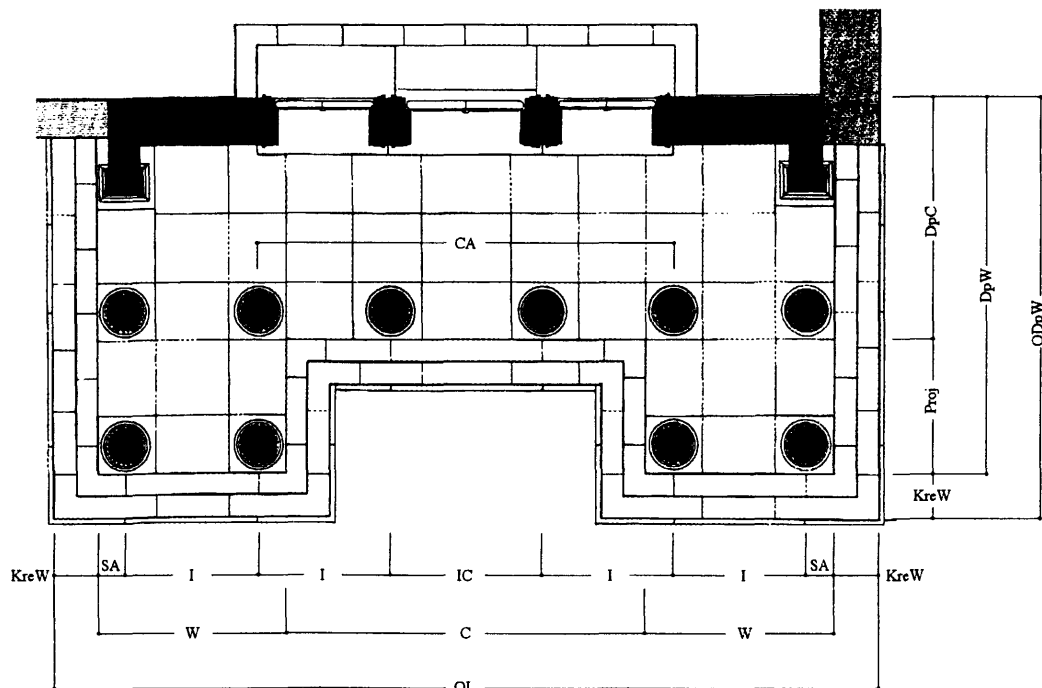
The plan of the propylon with wings at Samothrace
